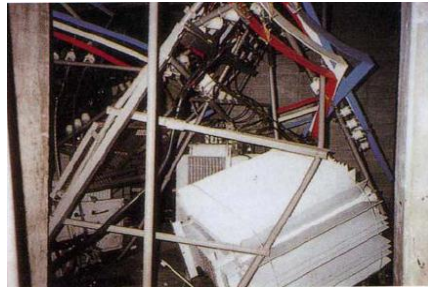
Transformer has over turned in open air electric facilities' site
